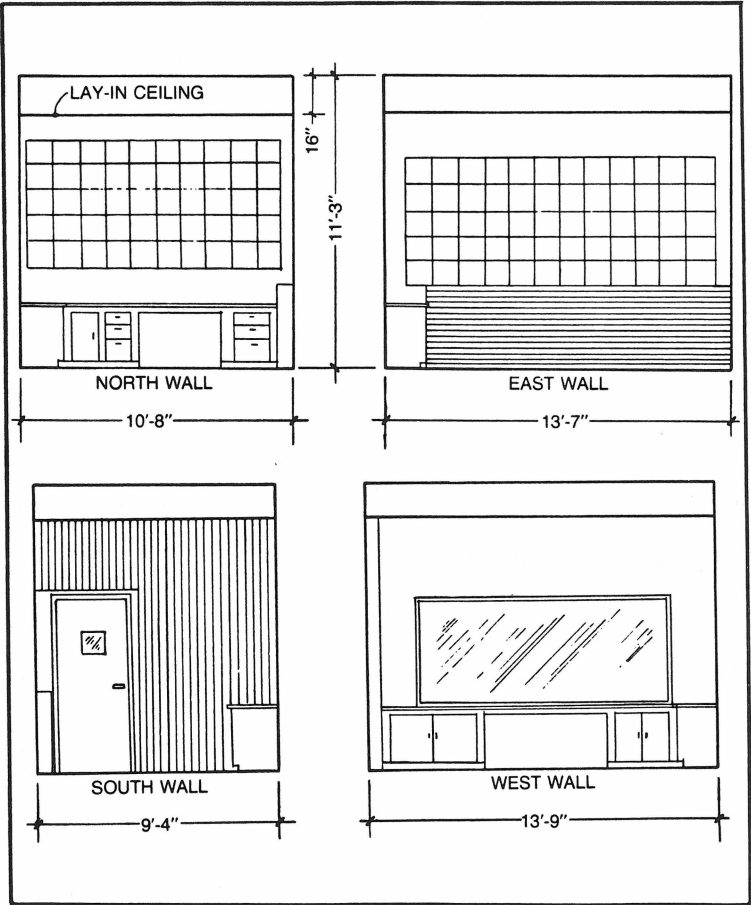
Control room wall elevations showing distribution of slat resonators and acoustical tile. A conventional suspended ceiling is used in the control room.
